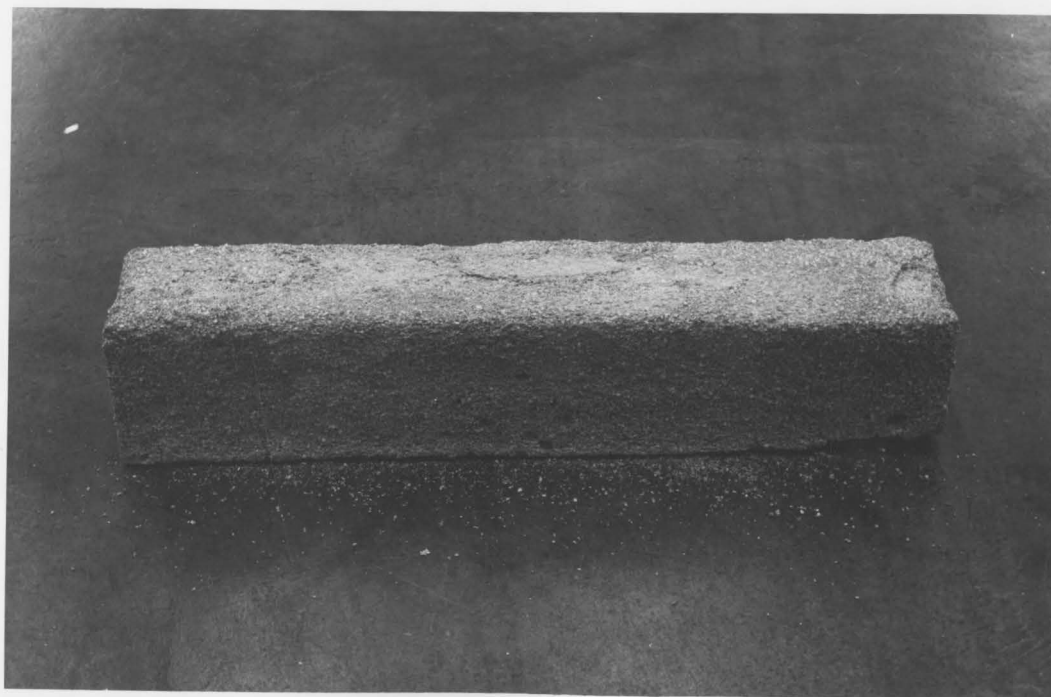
MIX P6 PERLITE CONCRETE SPECIMEN
